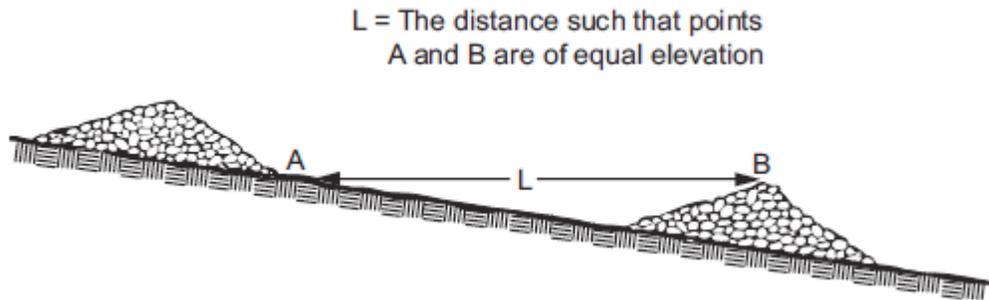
Spacing Between Rock Filter Dams and Stone Check Dams
